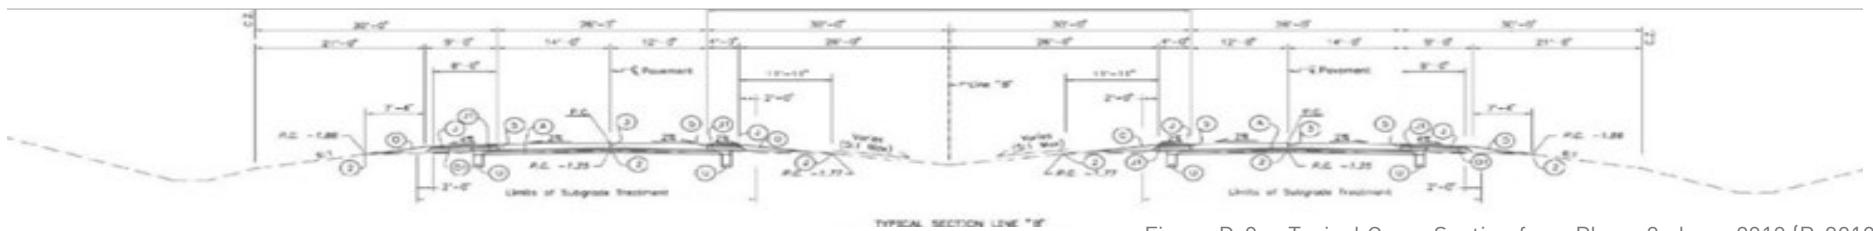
Typical Cross Section from Phase 3 plans, 2010 (R-30194)
